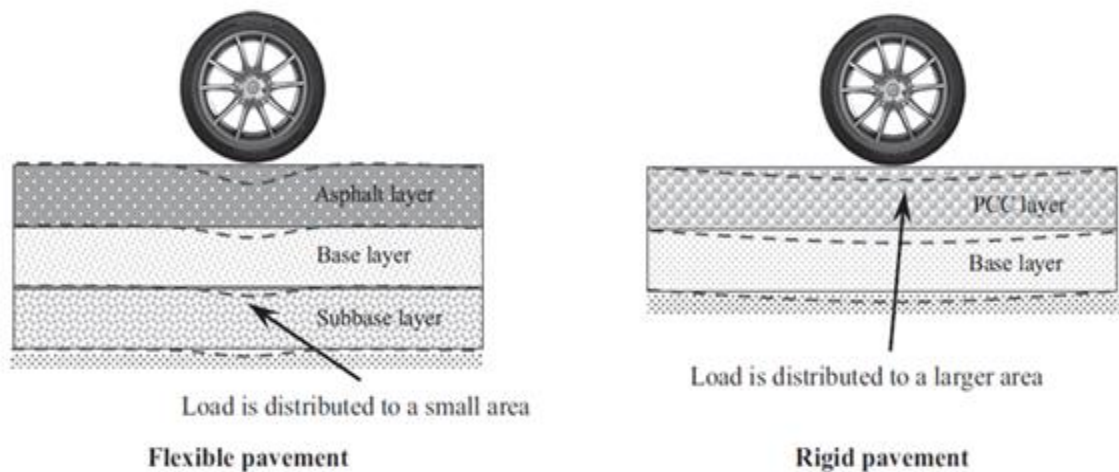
Deformation Behaviour of Flexible and Rigid Pavements
